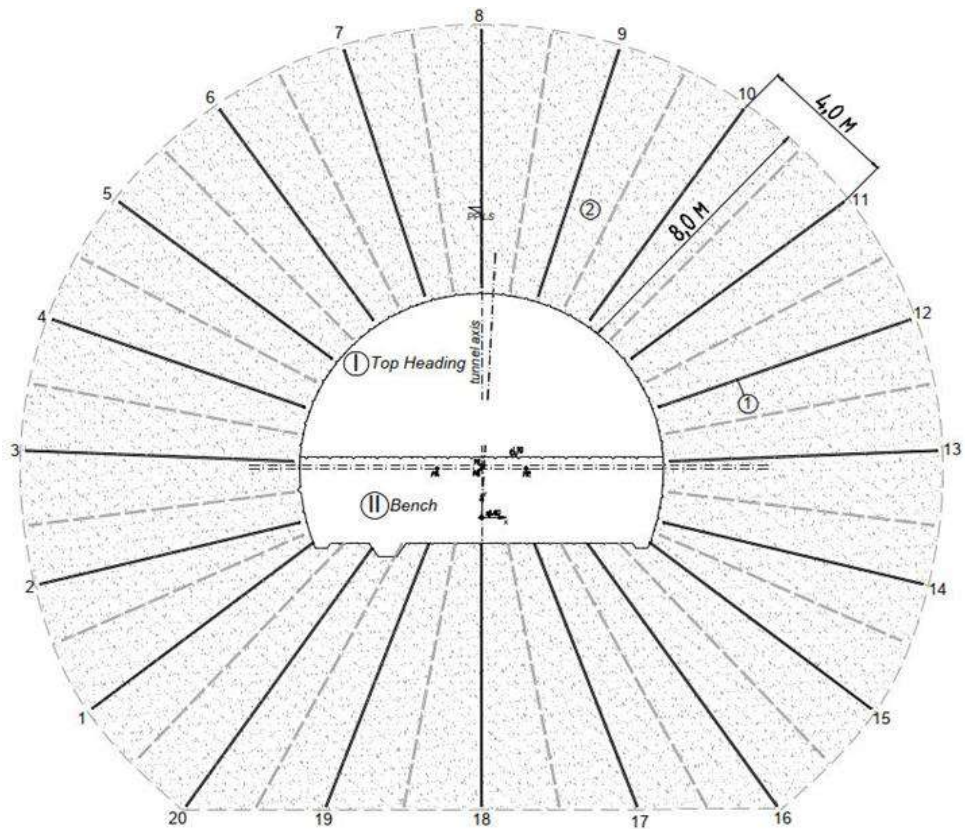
Typical pre-grouting layout for the tunnel with the single-layer load-bearing lining (Source: Spasojevic, 2022, 2025).
